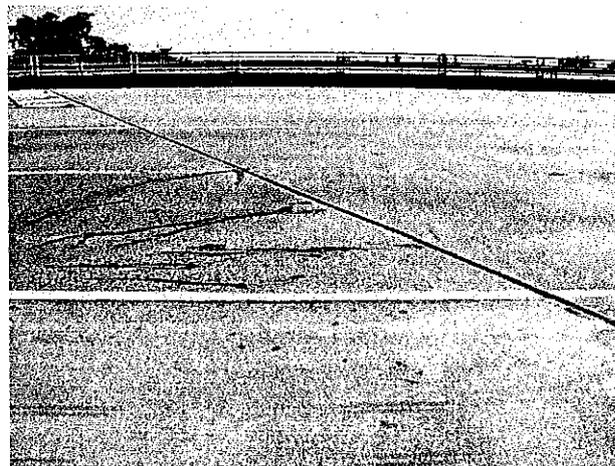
Bridge 29-0232L/R deck joint (non-suspect)
